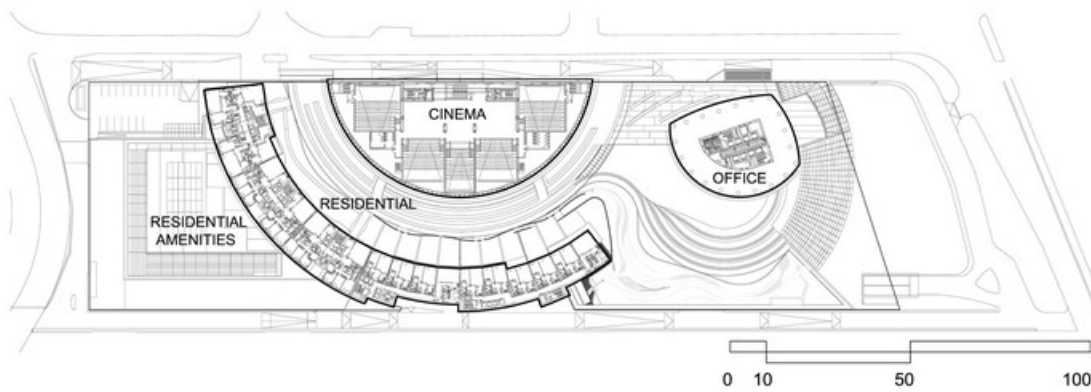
Kanyon site plan at height of the residential / cinema floor (Source: The Jerde Partnership).
